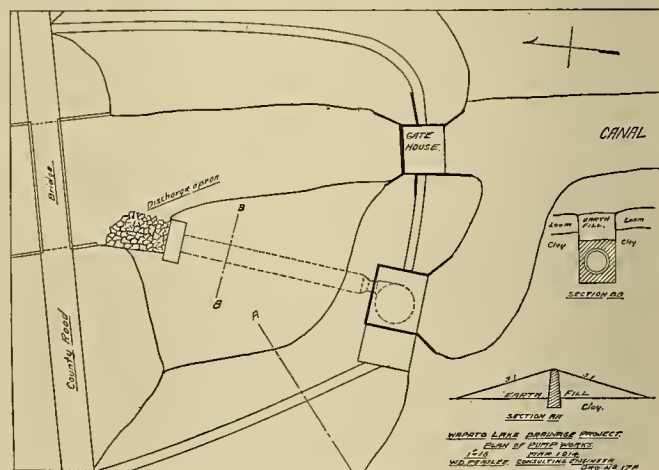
Plan of Pump Installation, Showing Sections of Dam and Pipe Trench.
